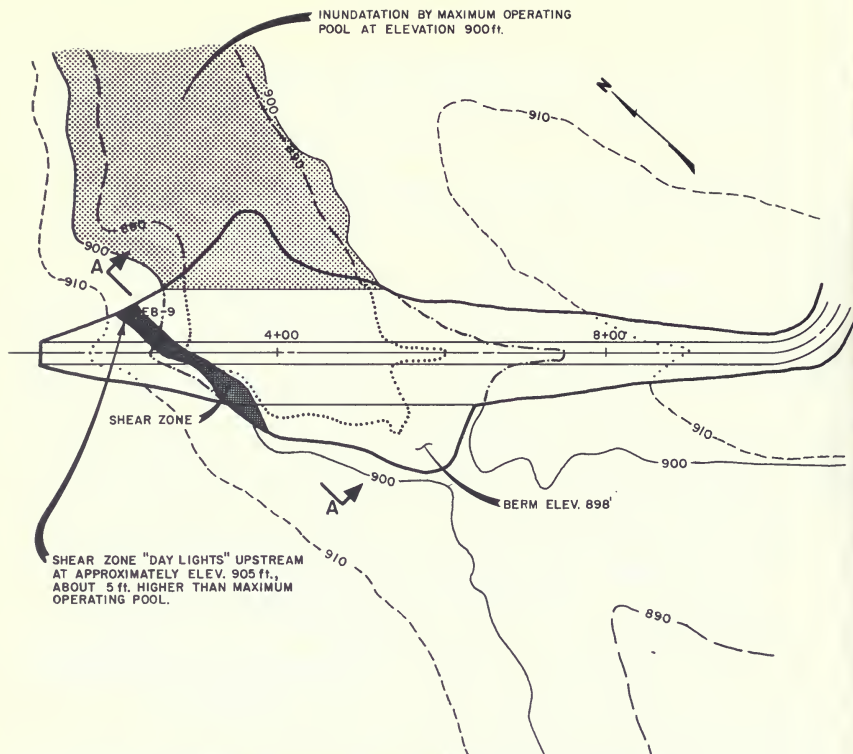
Plan View of Bidwell Canyon Saddle Dam—West Dam Shear Zone Details
